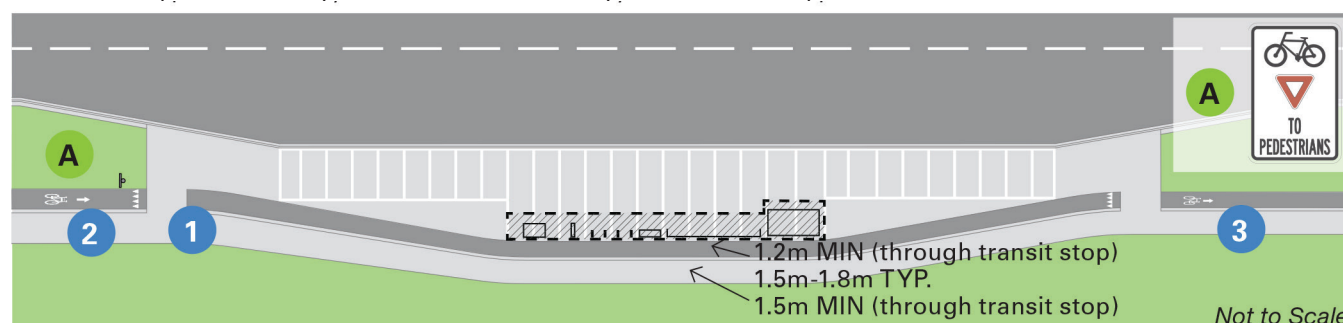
Separated Bikeway &amp; Sidewalk with Bus Bay - Constrained
